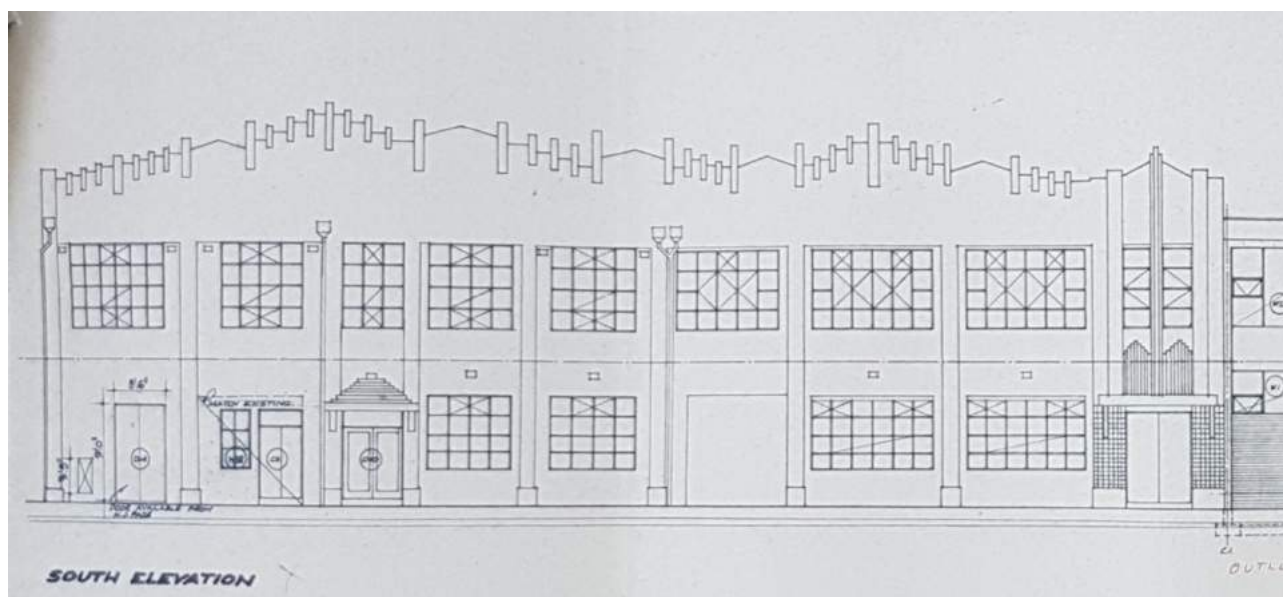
1965 drawings - detail of the two-storey Art Deco facade and its detail in 1965 (PROV, 12 March 1965).
